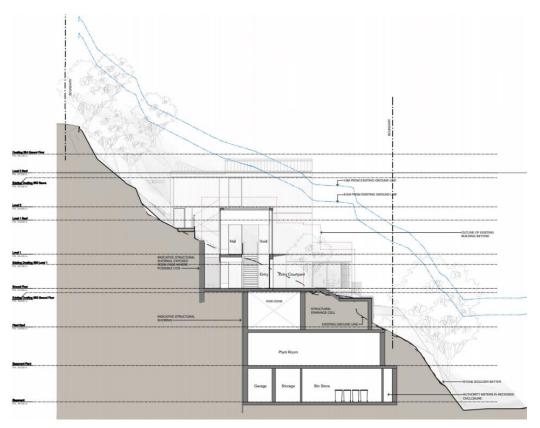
Proposed section 2 looking north, Extract from Sections Sheet 2 (Source: Drawing No. 3001, Rev. A)
